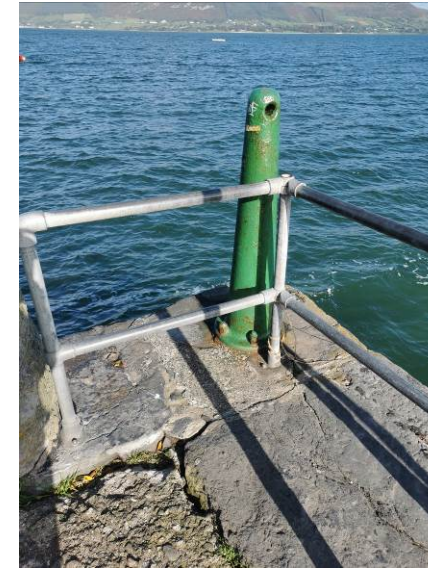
View of cast-iron handrail post to CH32, facing northeast
